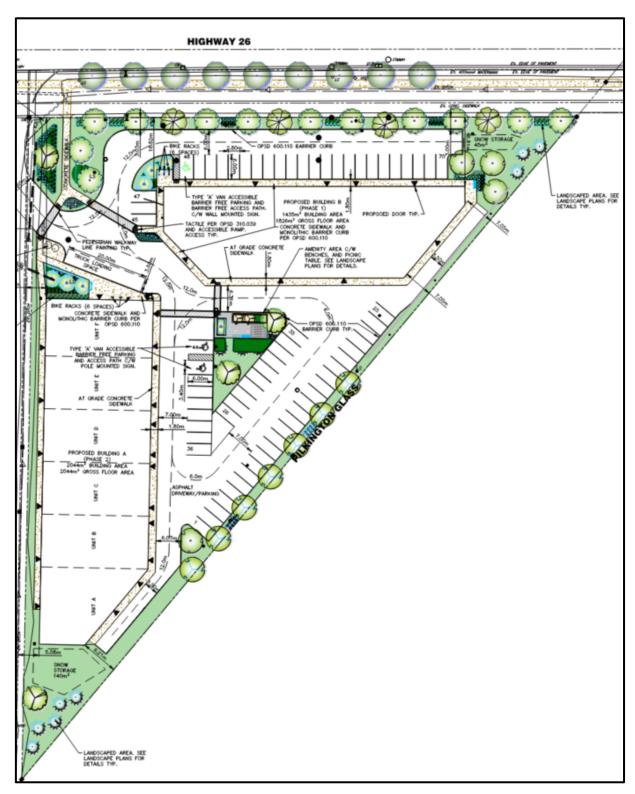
Proposed Site Plan showing the overall site layout and landscaping interface with Highway 26. Building 'A' is oriented north to south on western portion of the property, while Building 'B' is oriented east to west on the northern portion of the property.
